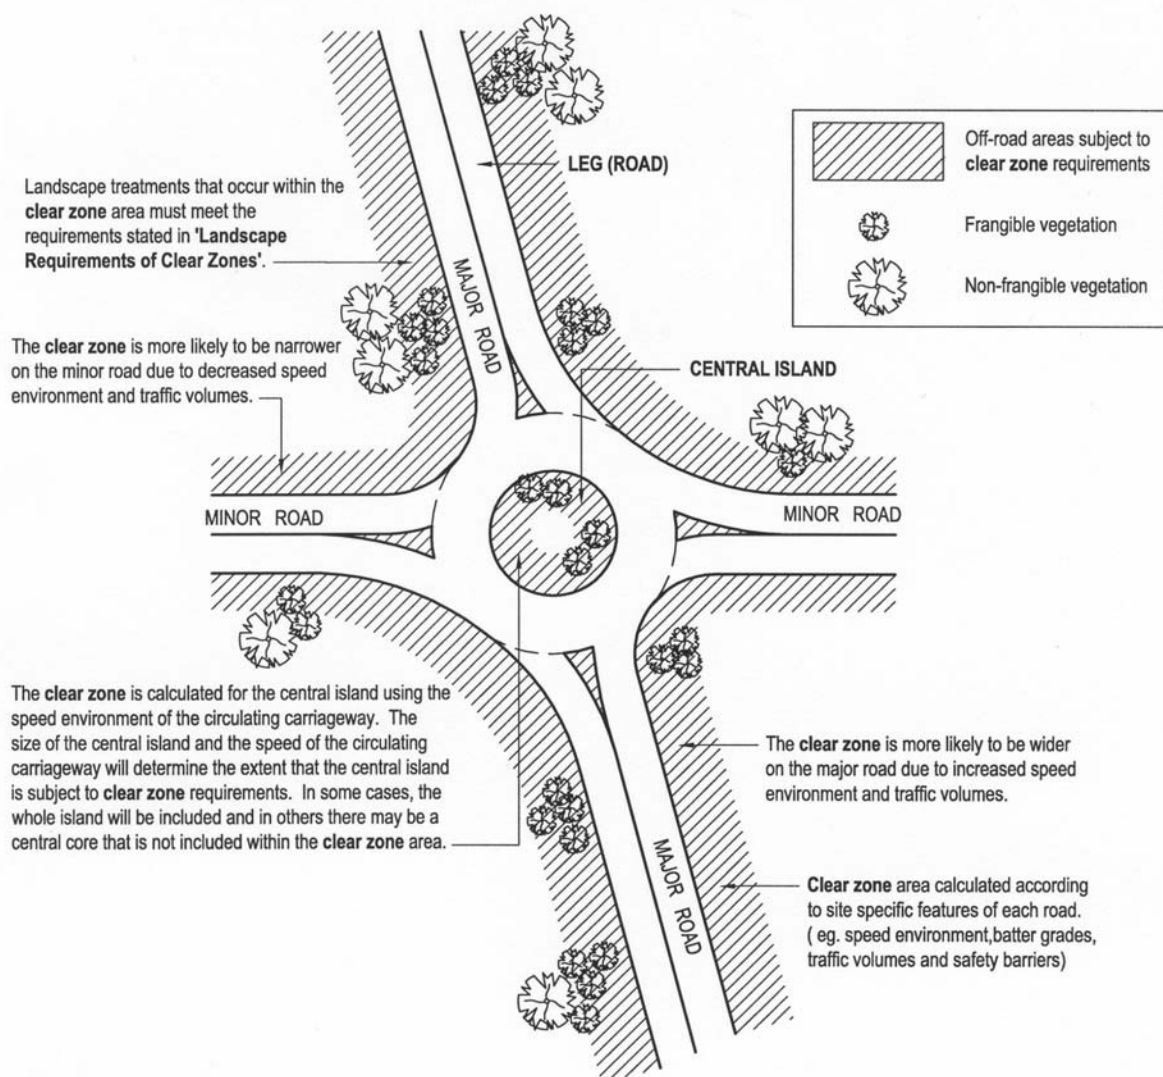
Off-road areas subject to clear zone requirements at a roundabout – Plan
